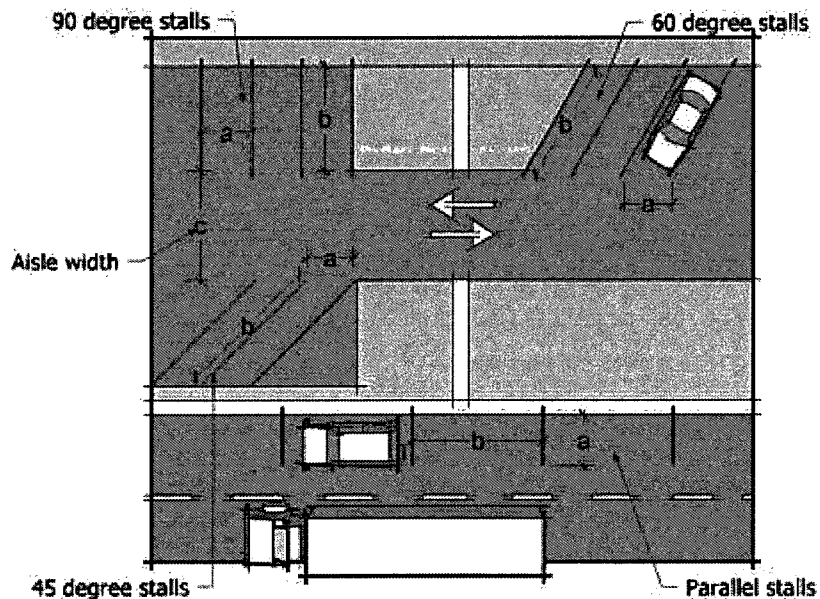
Parking Space and Drive Aisle Dimensions
